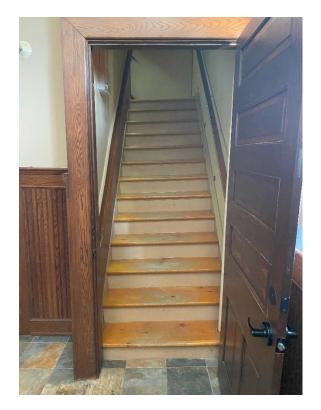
Unlevel Stairs at the Northeast Corner of the Building
